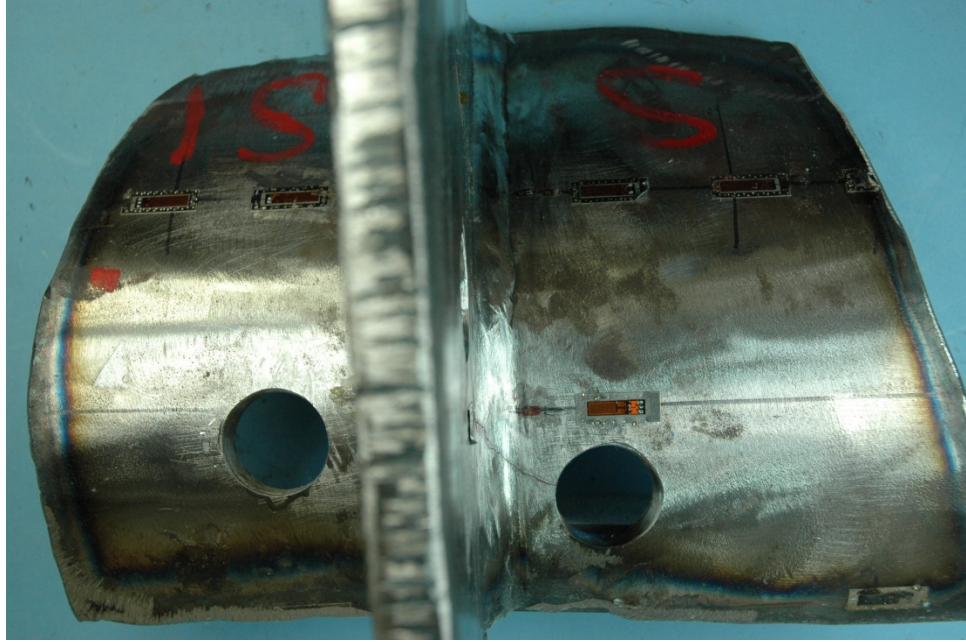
Portion of rib and floor beam containing the south side crack cut out of the mock-up specimen MU1
